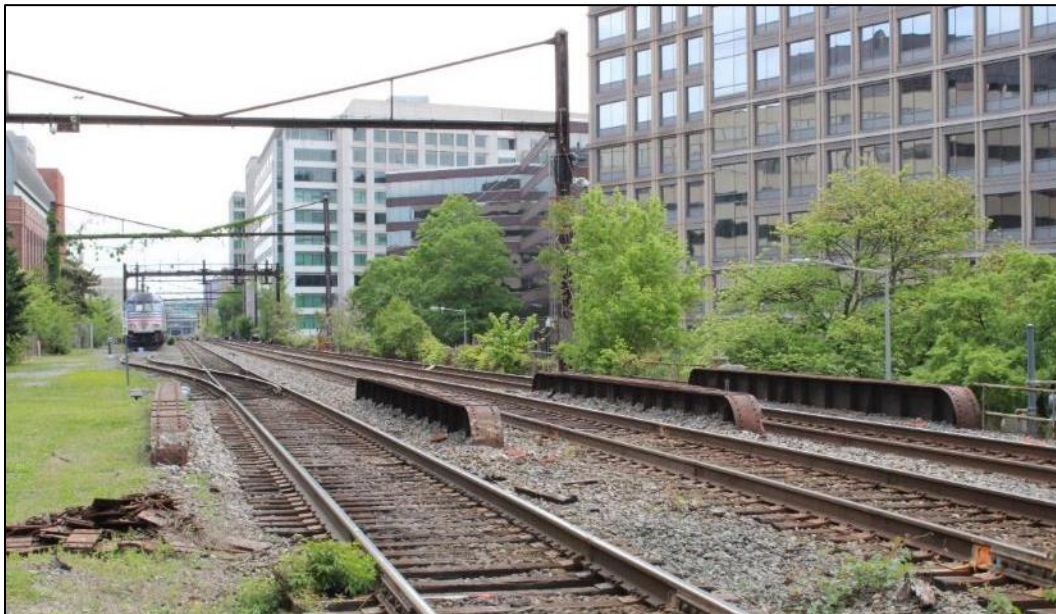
View of the top of the 6th Street Bridge as seen from the Virginia Rail Express L'Enfant Station platform, facing southeast. Note the original steel through girders visible between the railroad tracks (VHB 2024).
